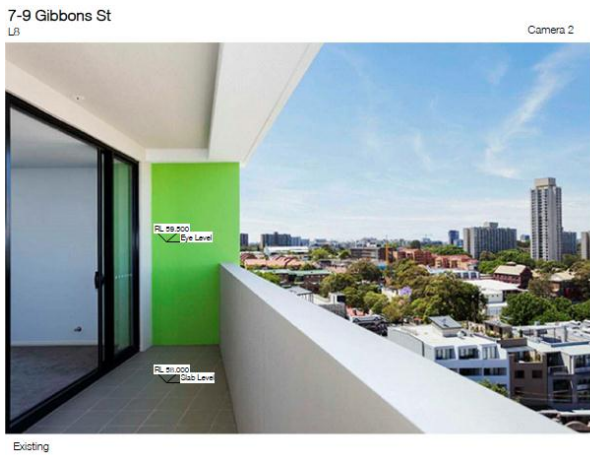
Views to the south from the balconies and living rooms of 'Apartments D' at 7-9 Gibbons Street will not be impacted by the proposal (image from level 8)
